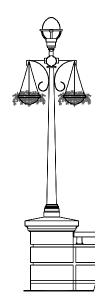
Bridge End Pier Elevation with light standard and floral baskets.
